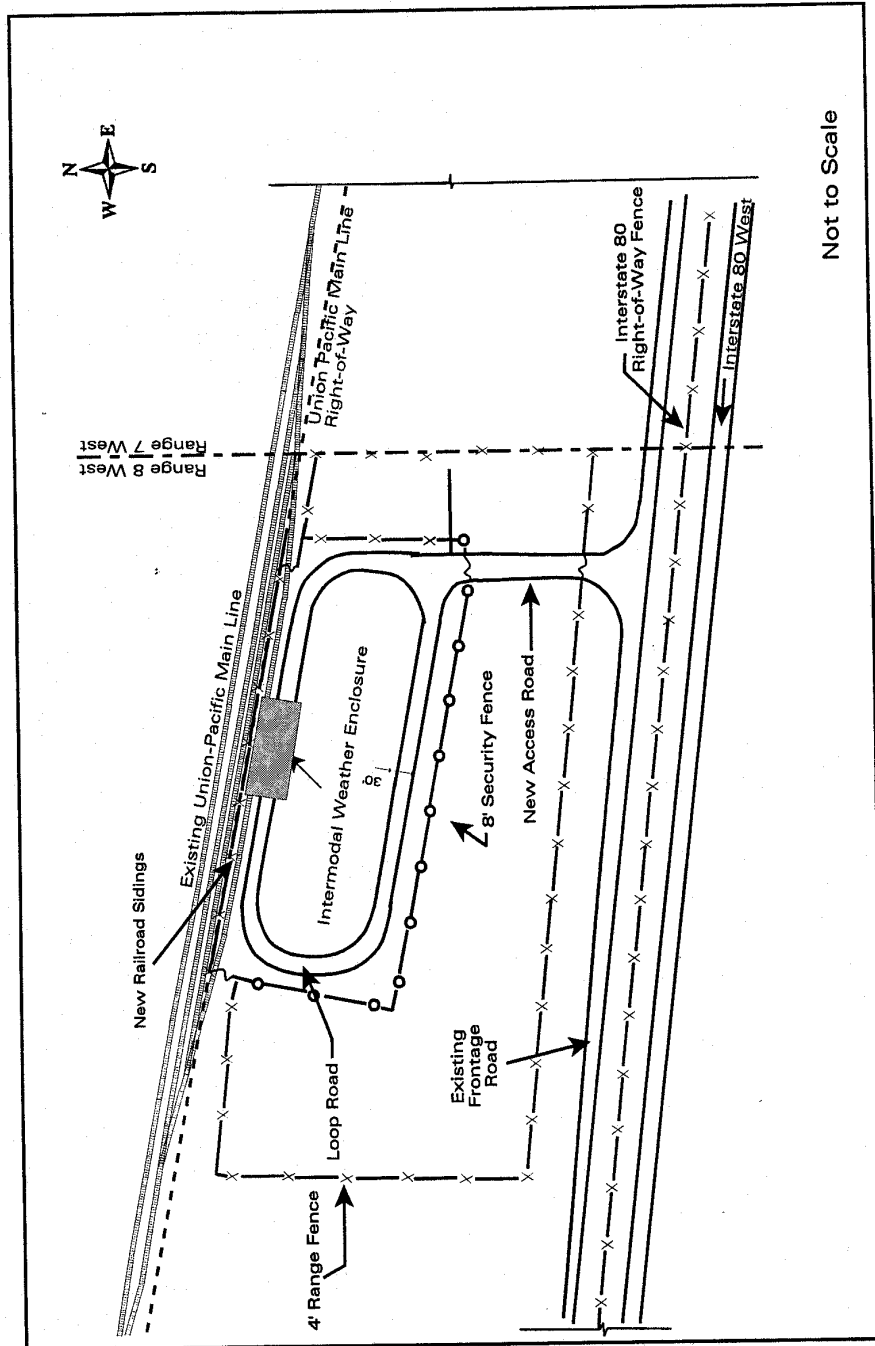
Basic site plan and layout for the Intermodal Transfer Facility.
